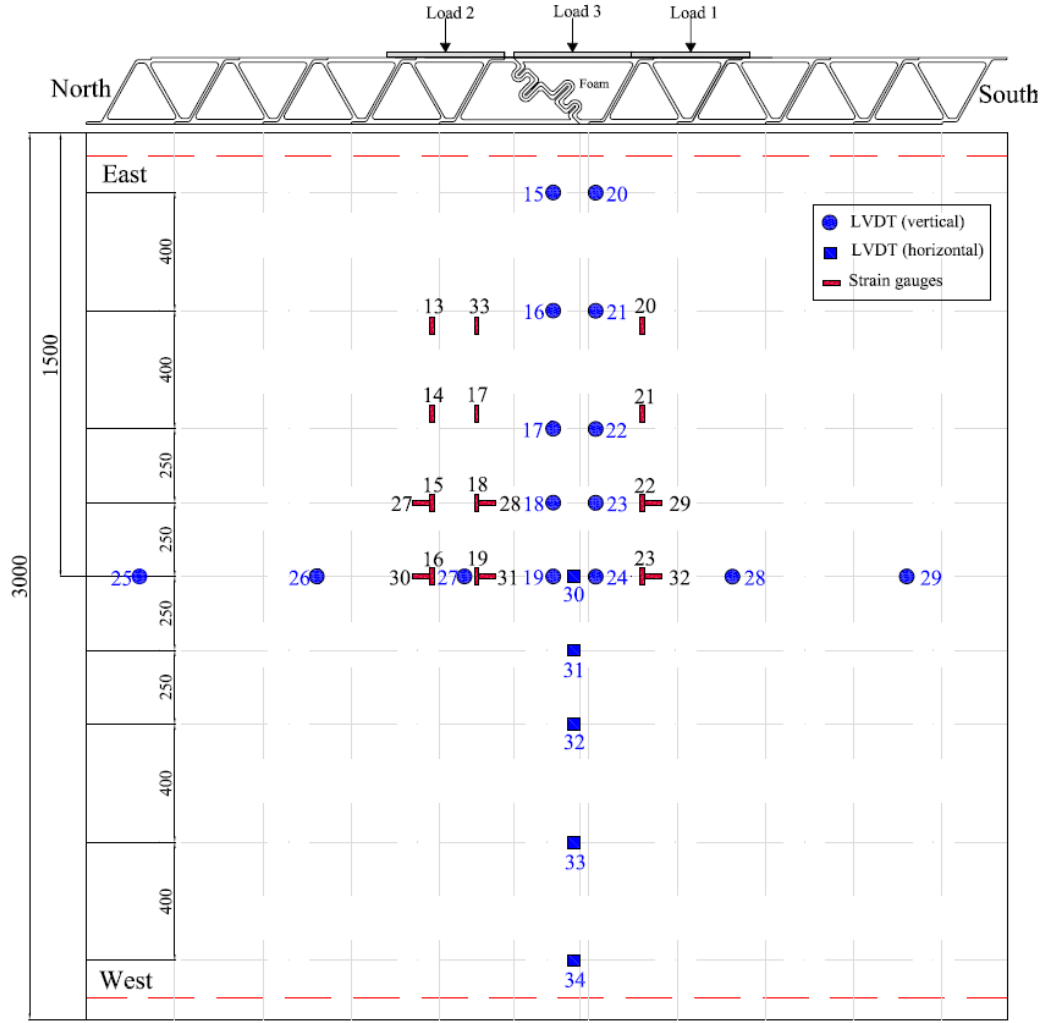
Displacement transducers (LVDTs) and strain gauges at the bottom flange.
